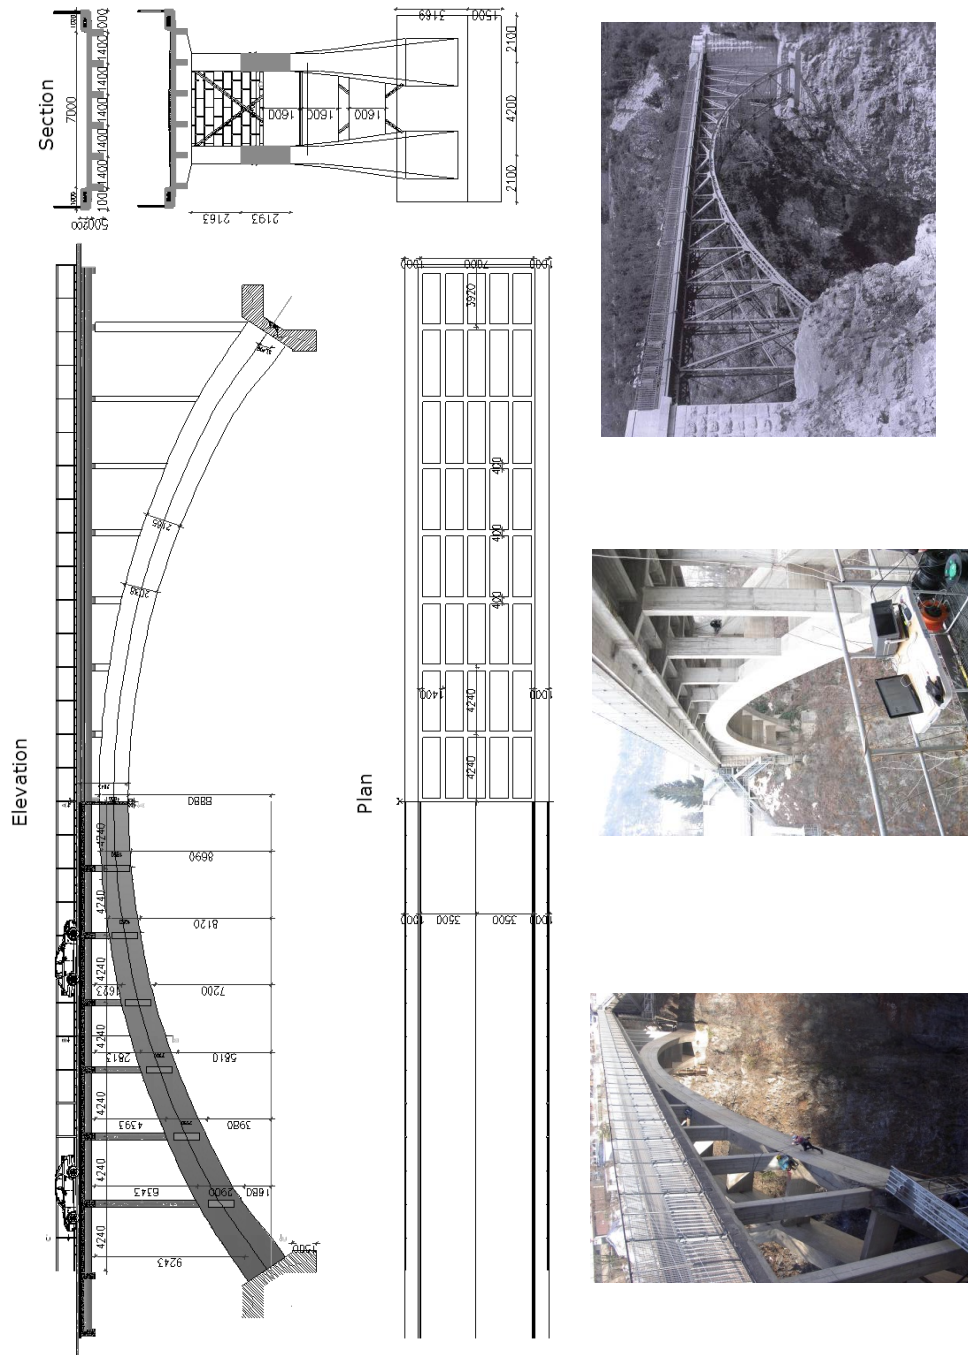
St. Giustina bridge: plan, elevation, cross-sections and photos.
